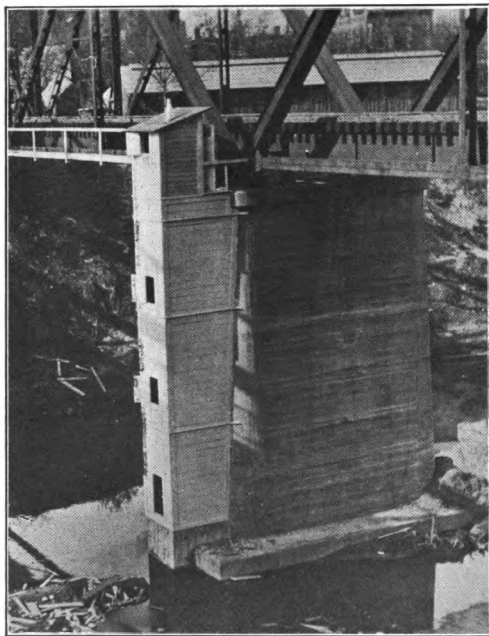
Wooden Well and Shelter installed by the U. S. Geological Survey on the Brazos River at Waco, Texas. Equipped with a Gurley Graphic Register. Note method of installation against bridge pier, instead of at usual place on stream bank.
